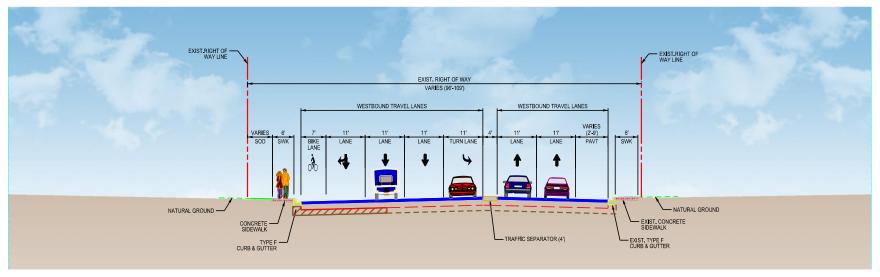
Typical Section - Lantana Road west of Andrew Redding Road
